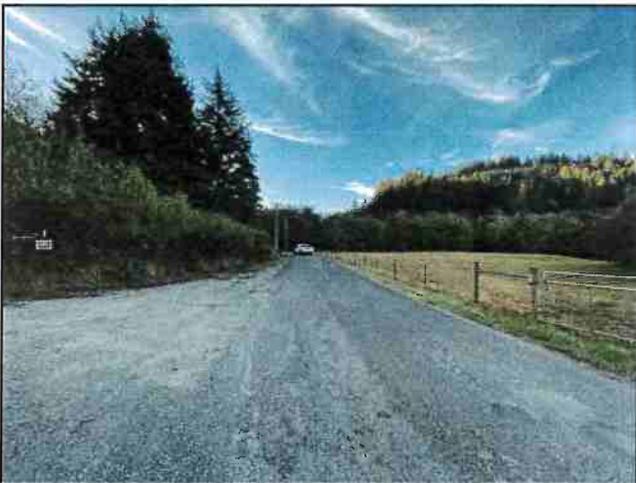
Williams Creek Rd Looking South @ Driveway and Pullout Location
